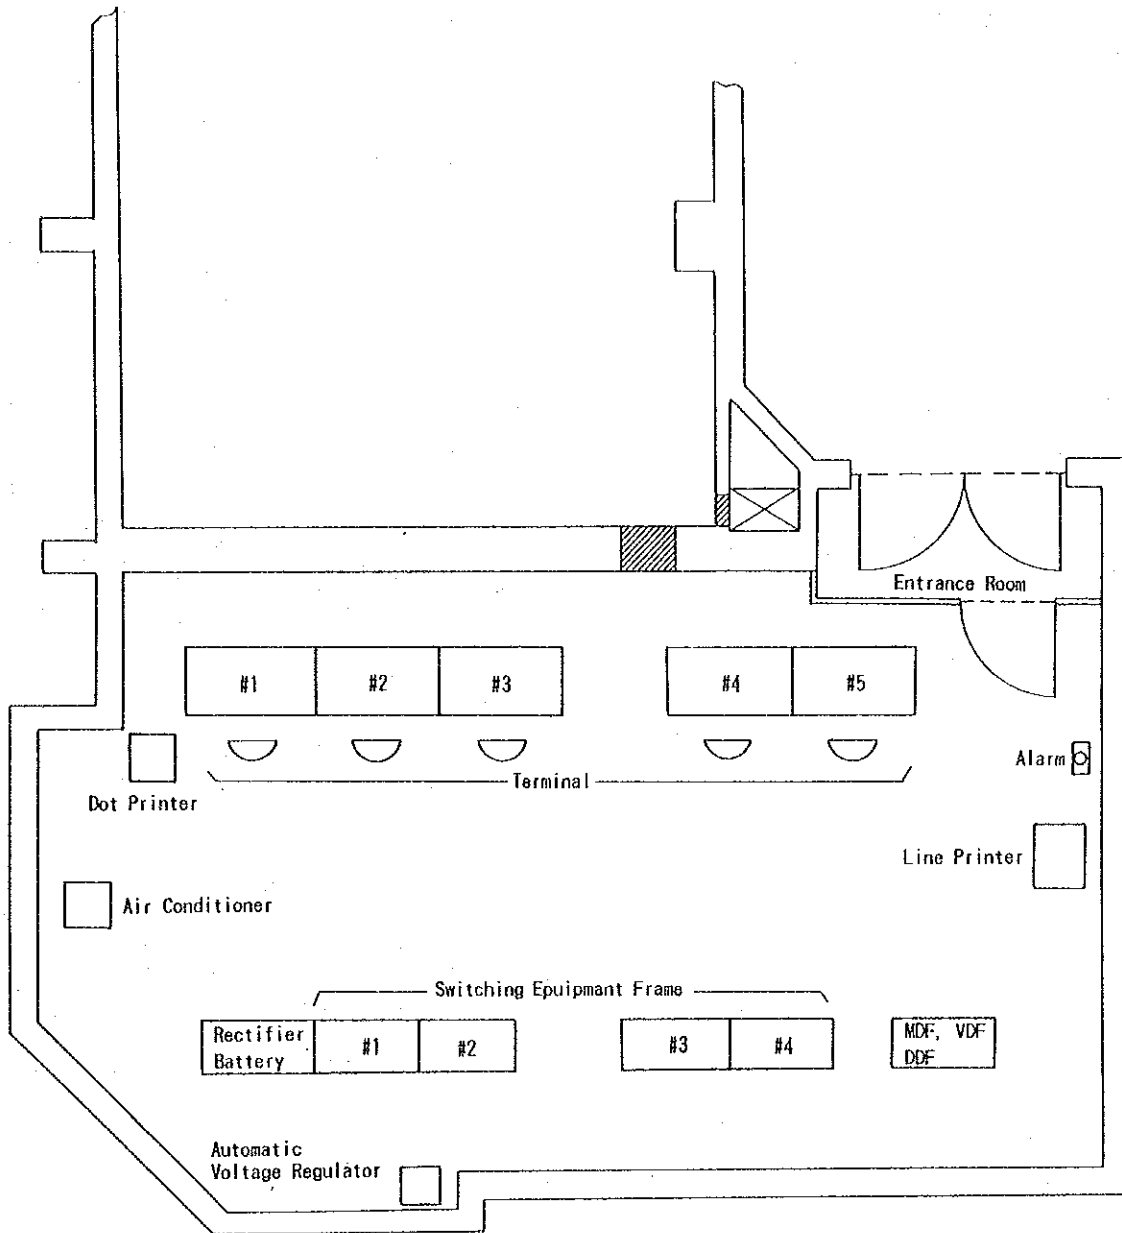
Equipment Layout Plan in Switching Laboratory Room
